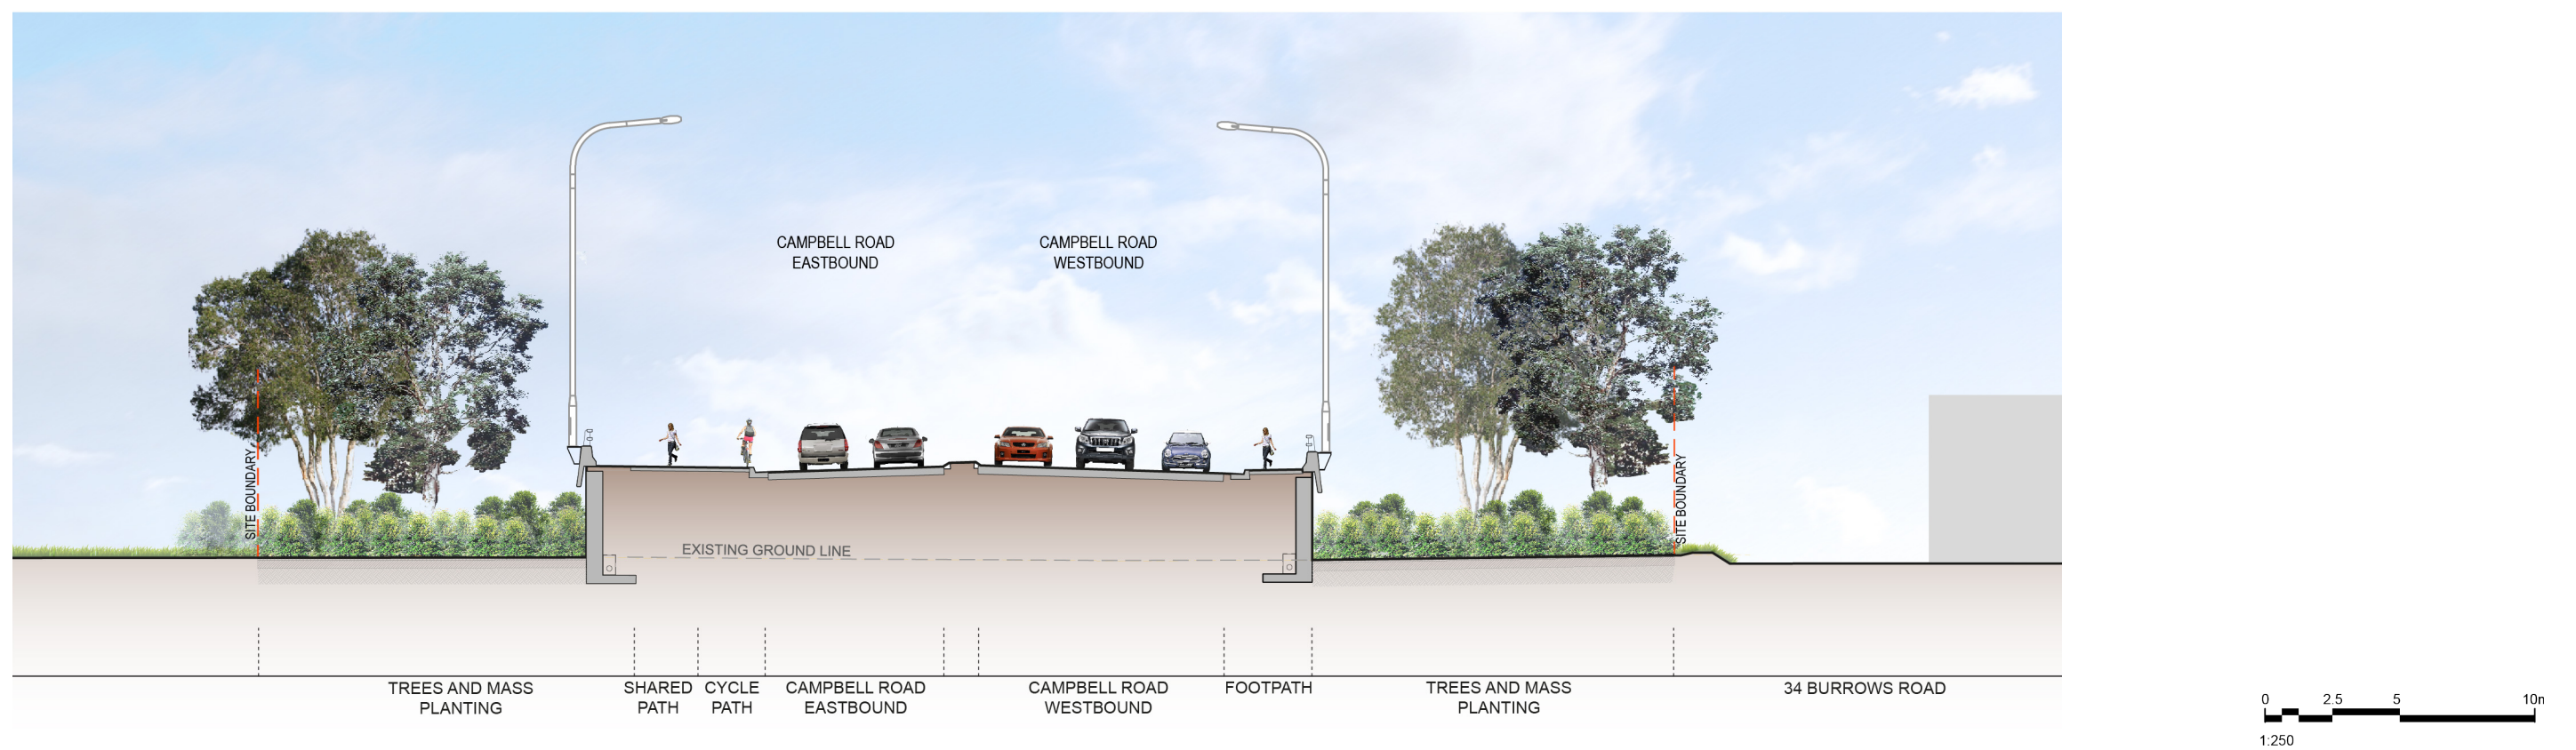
Typical Cross Section - Approach to Alexandra Canal - 1:250
